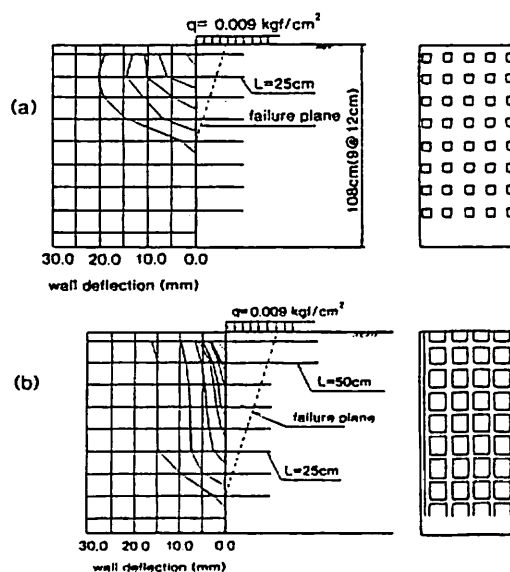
(a) Wall face arrangements, and (b) failure patterns seen in two model nailed sand walls upon the release of propping blocks from the top (Muramatsu et al., 1992).
